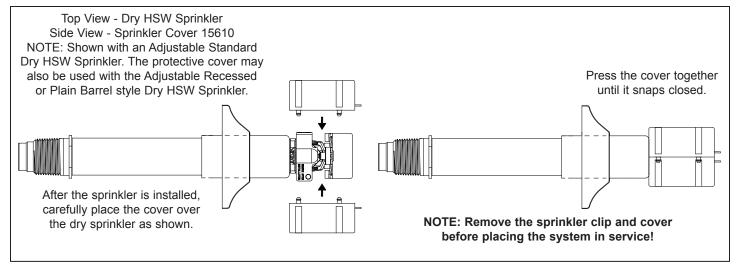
Dry Horizontal Sidewall Sprinkler Cover Part Number 15610 (shown with an Adjustable Standard Dry HSW Sprinkler) (Optional for temporary use with Viking Dry HSW Sprinklers until finish work is completed around the sprinkler.)
